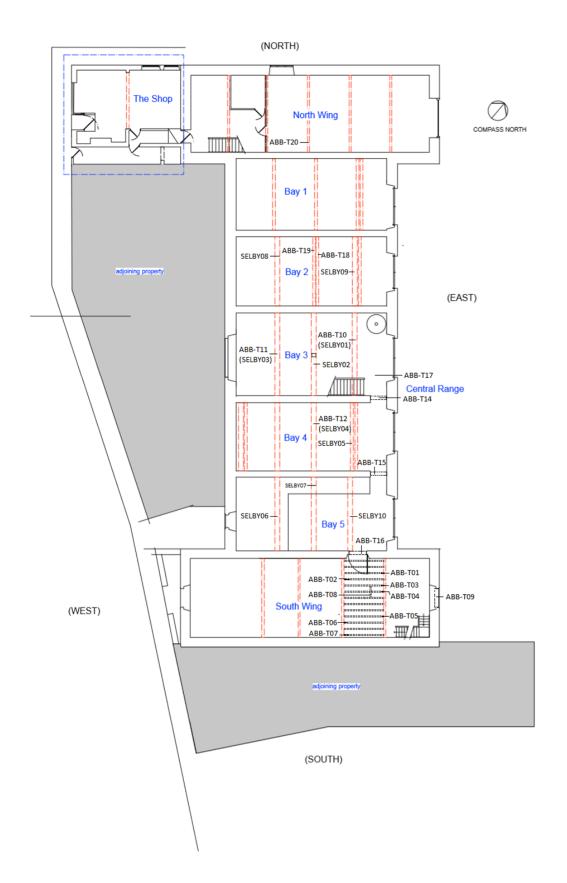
Ground-floor plan, showing sampled timbers, with exception of ex situ *beam ABB-T13/SELBY11 (after Wiles & Maguire)
